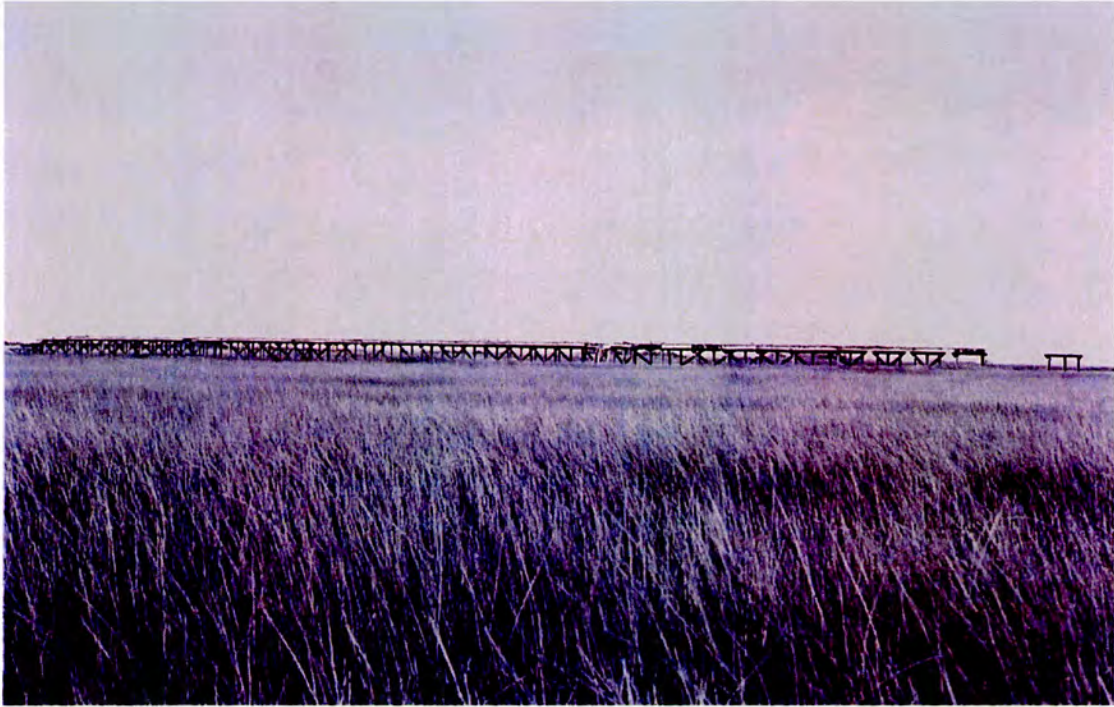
New Inlet Bridges – bents of central section of northern bridge, looking west
